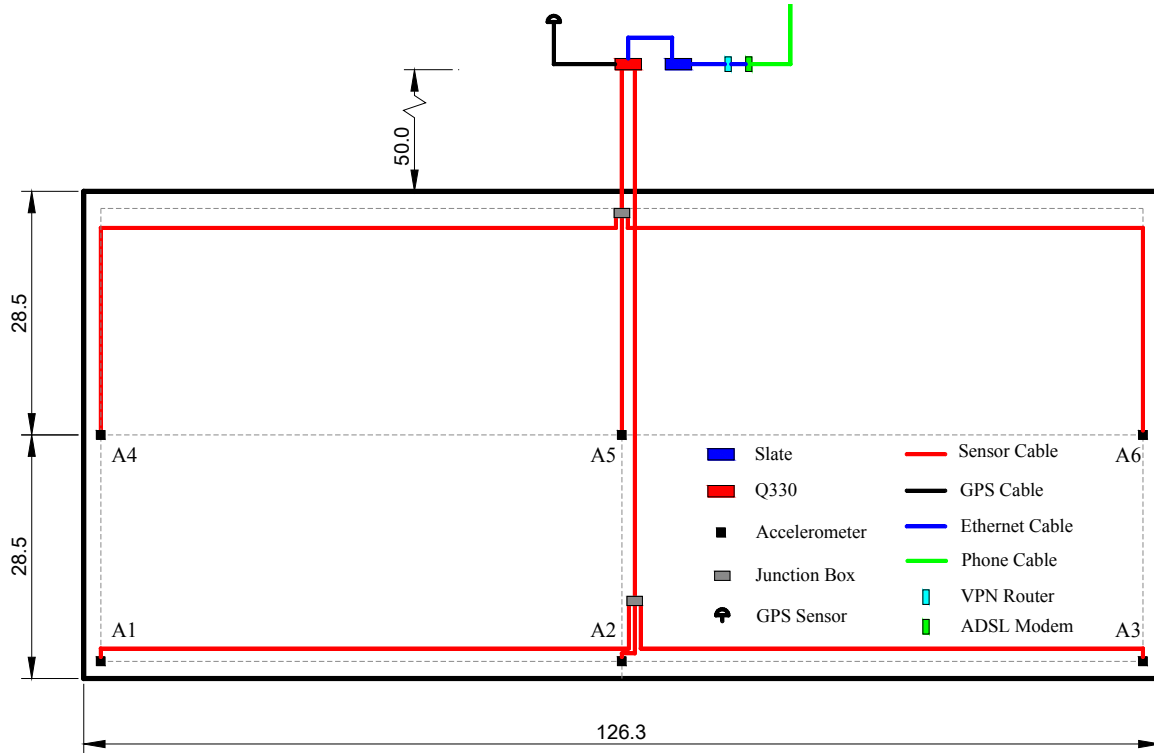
Plan of the Monitoring System of the Braga Stadium roof (view of the top face of the west slab).
